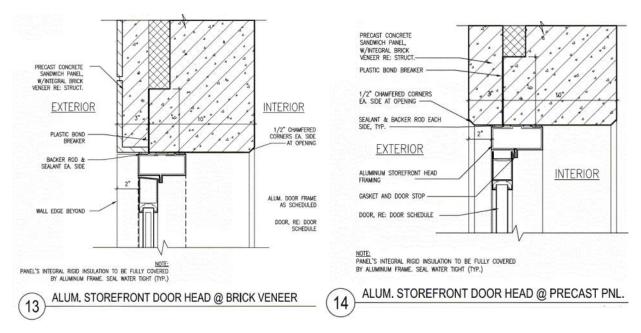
and Image 12 – Typical wall details showing precast panels and brick veneer assembly at aluminum storefront door heads (11/20/08 Construction Set).
